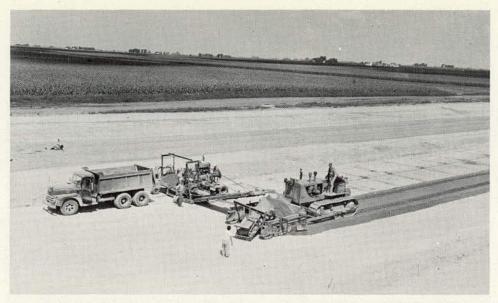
Placing sand-gravel mulch on embankment from outside shoulder.
